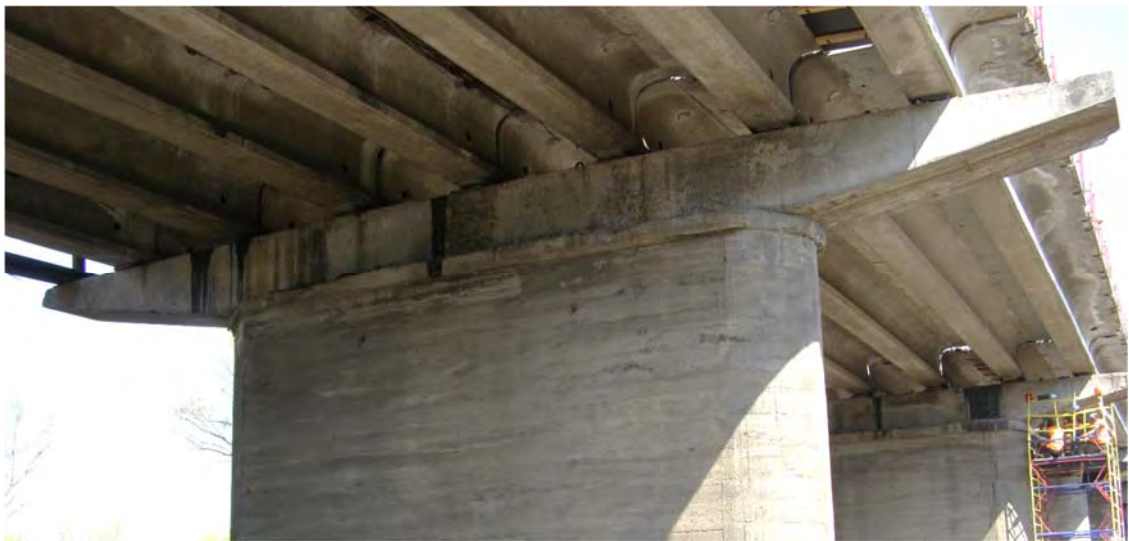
Example of a typical crossbar system (variable height) of a beam bridge, where the central trunk of the bridge support is made in the form of a massive rod
